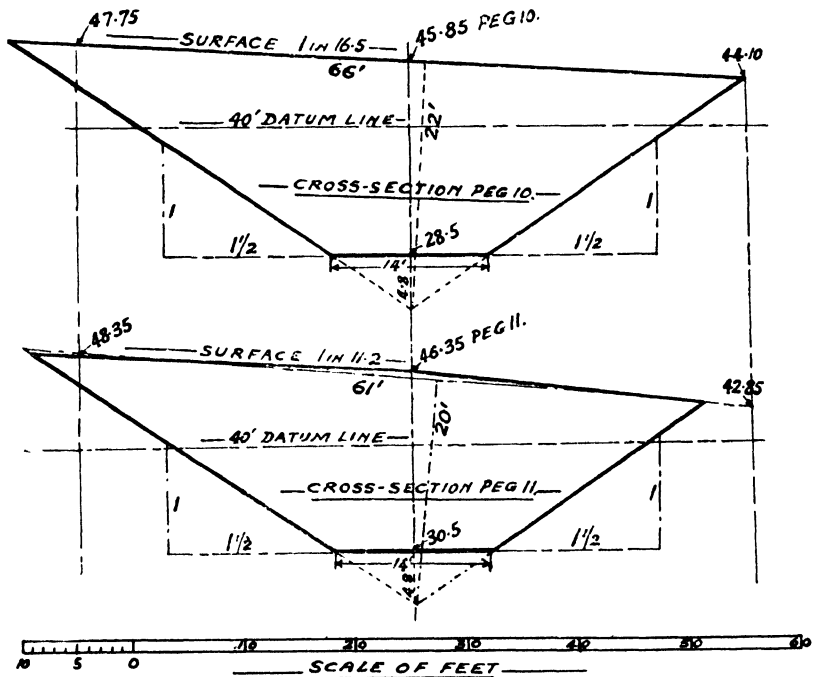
Cross-sections of Railway Cutting at Pegs 10 and 11.
